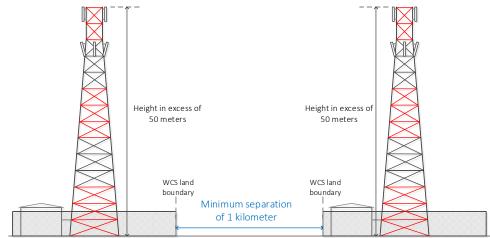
TOWER TO TOWER SEPARATION DISTANCE
